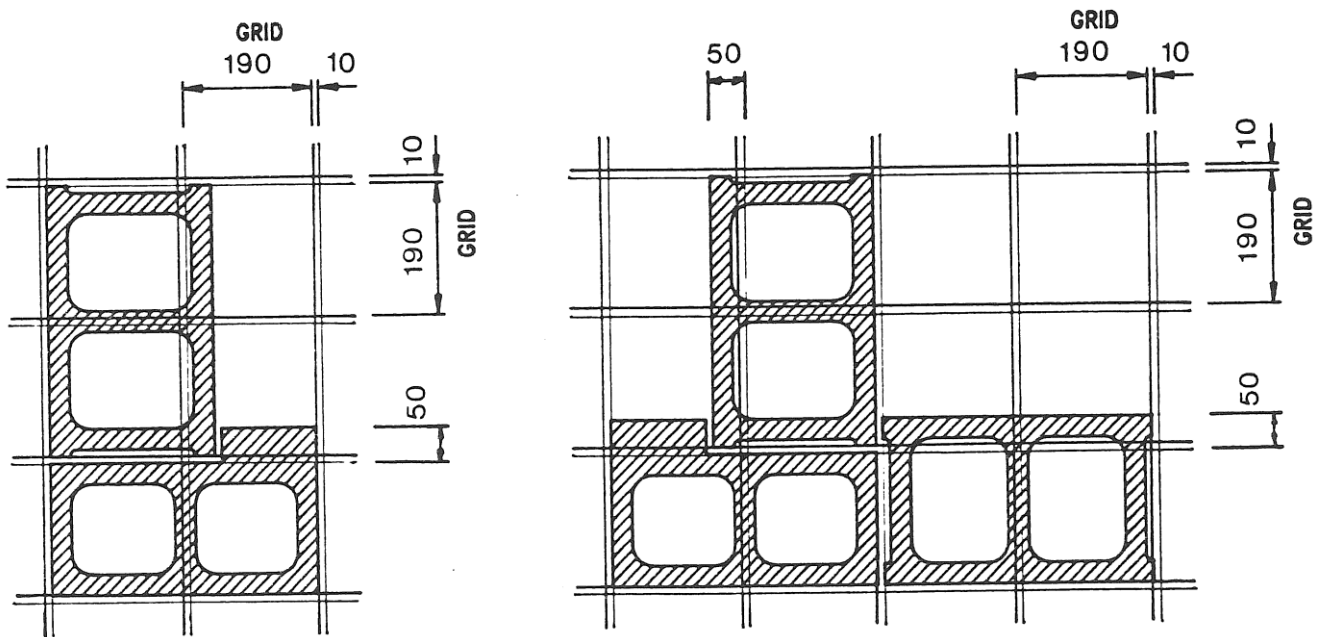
(a): Enlarged Details of the Corner and Interior Wall of the 25 Series
